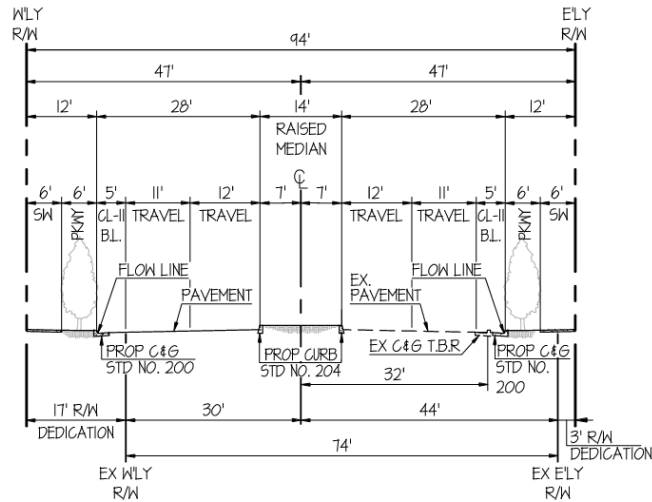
, Standard Street Sections – Secondary Arterial (Frontage Road)
